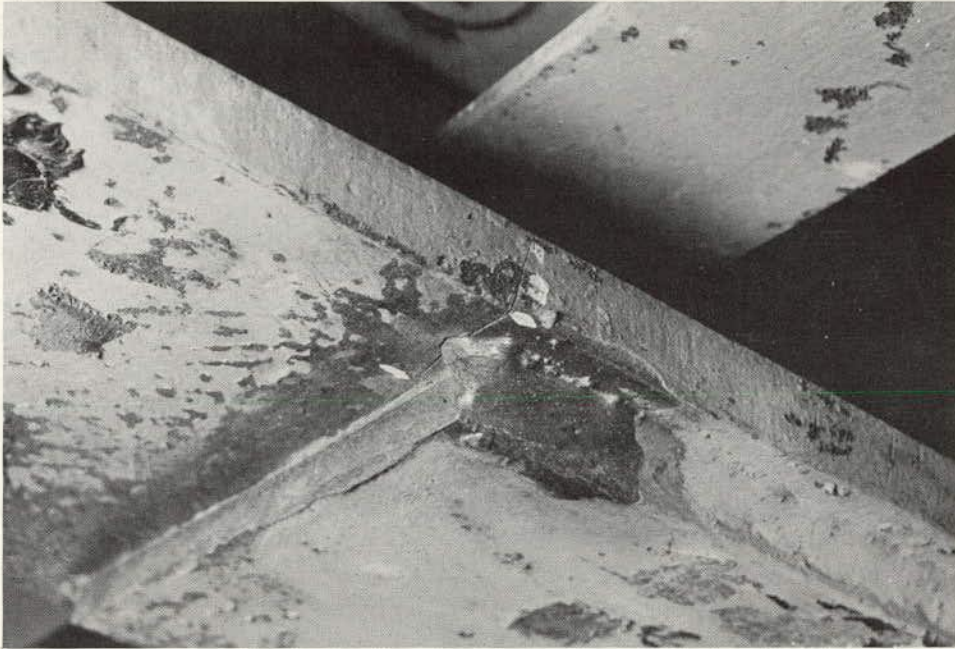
Fatigue cracking on Bridge 3B.
